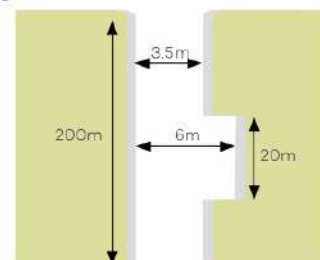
Requirements for access over 200m (Technical Guide | Planning Permit Applications – Bushfire Management Overlay DELWP 2017)
